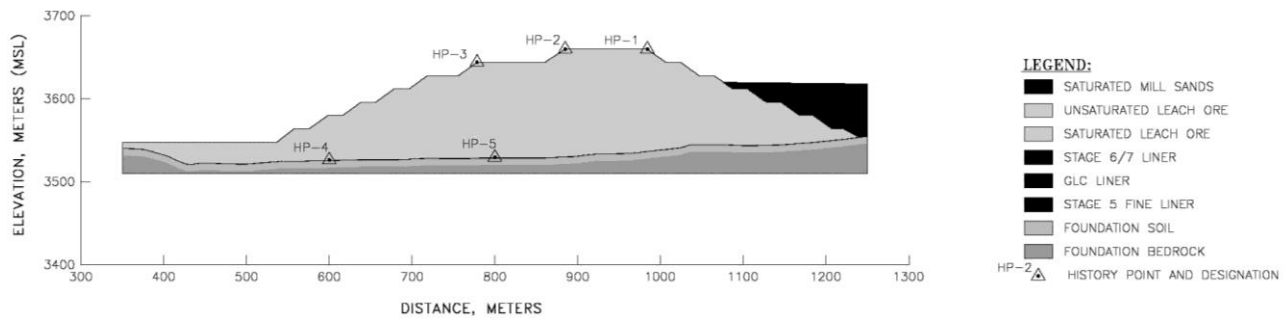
Section B crest elevation 3660 geomechanical (FLAC) model
